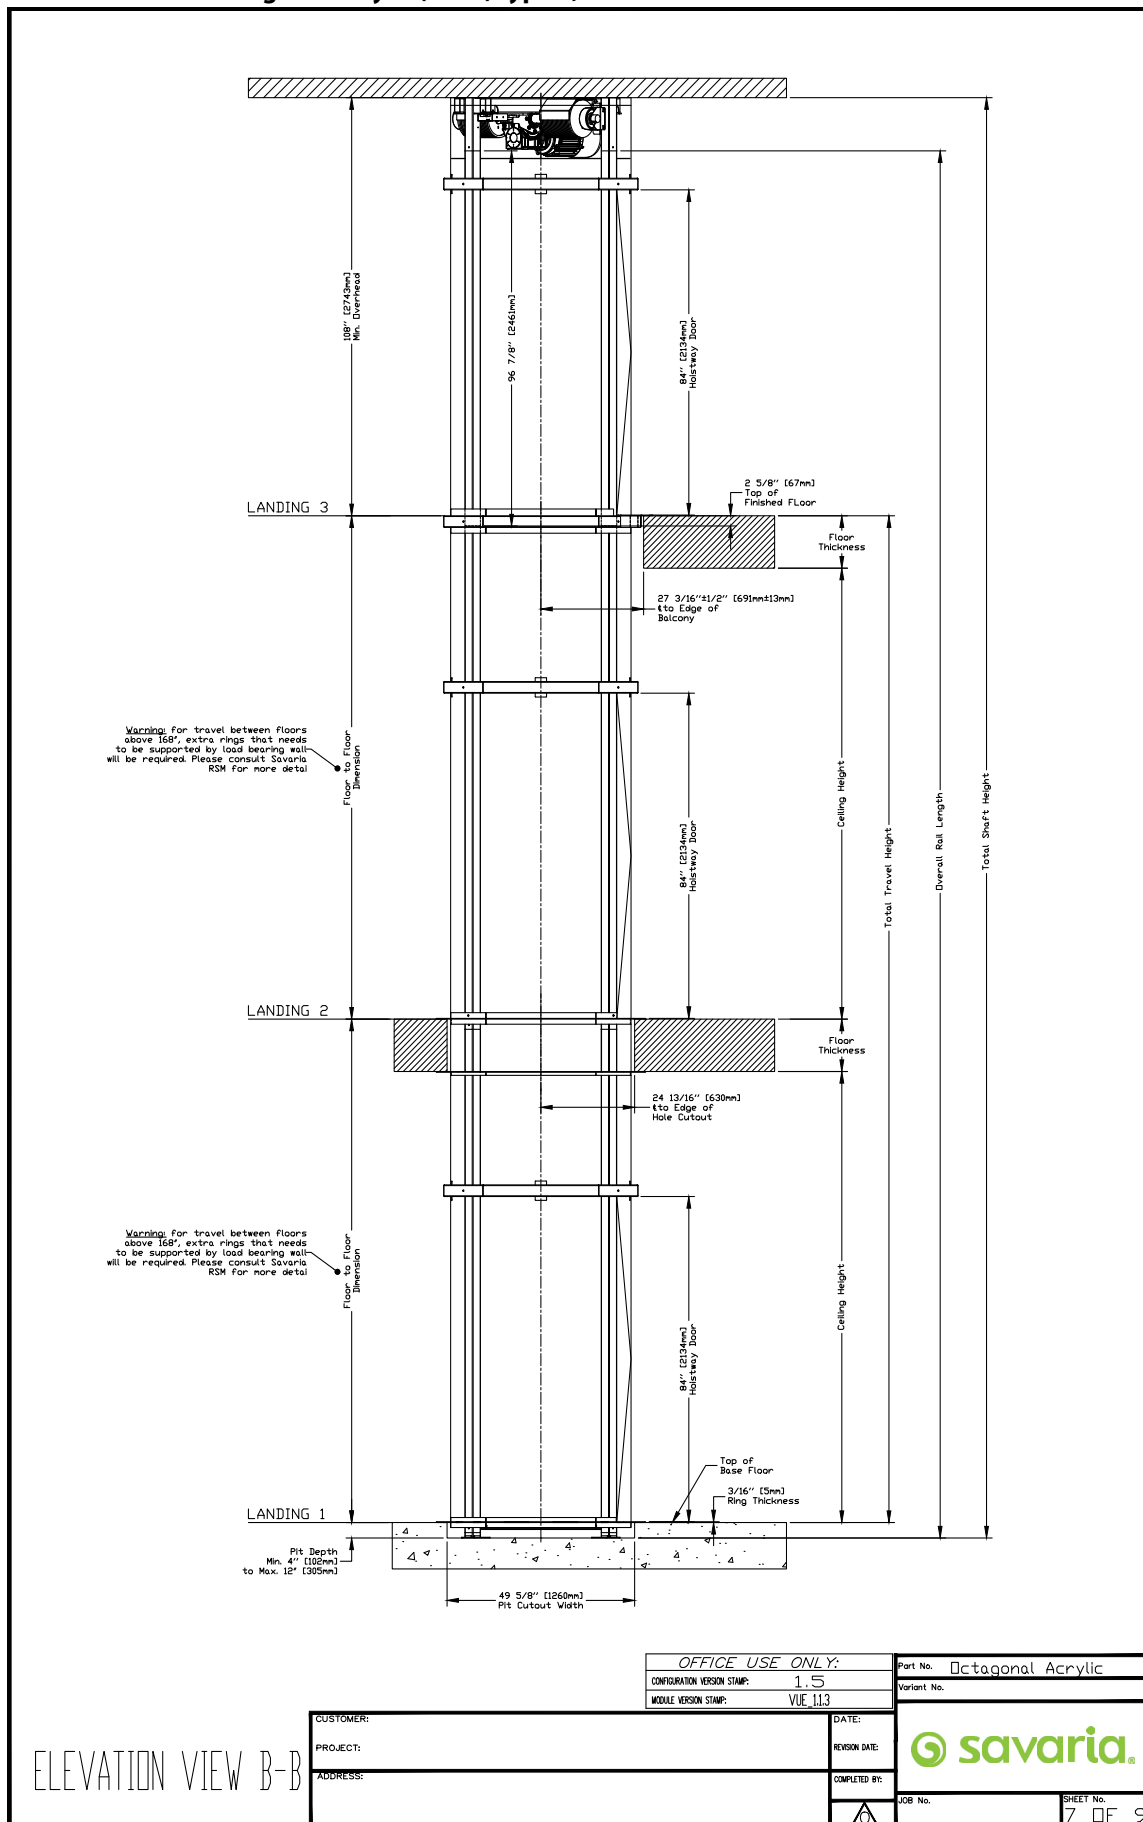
Pit cutout/thru-floor cutout - octagonal acrylic (OAM) type 1, 2 or 3
